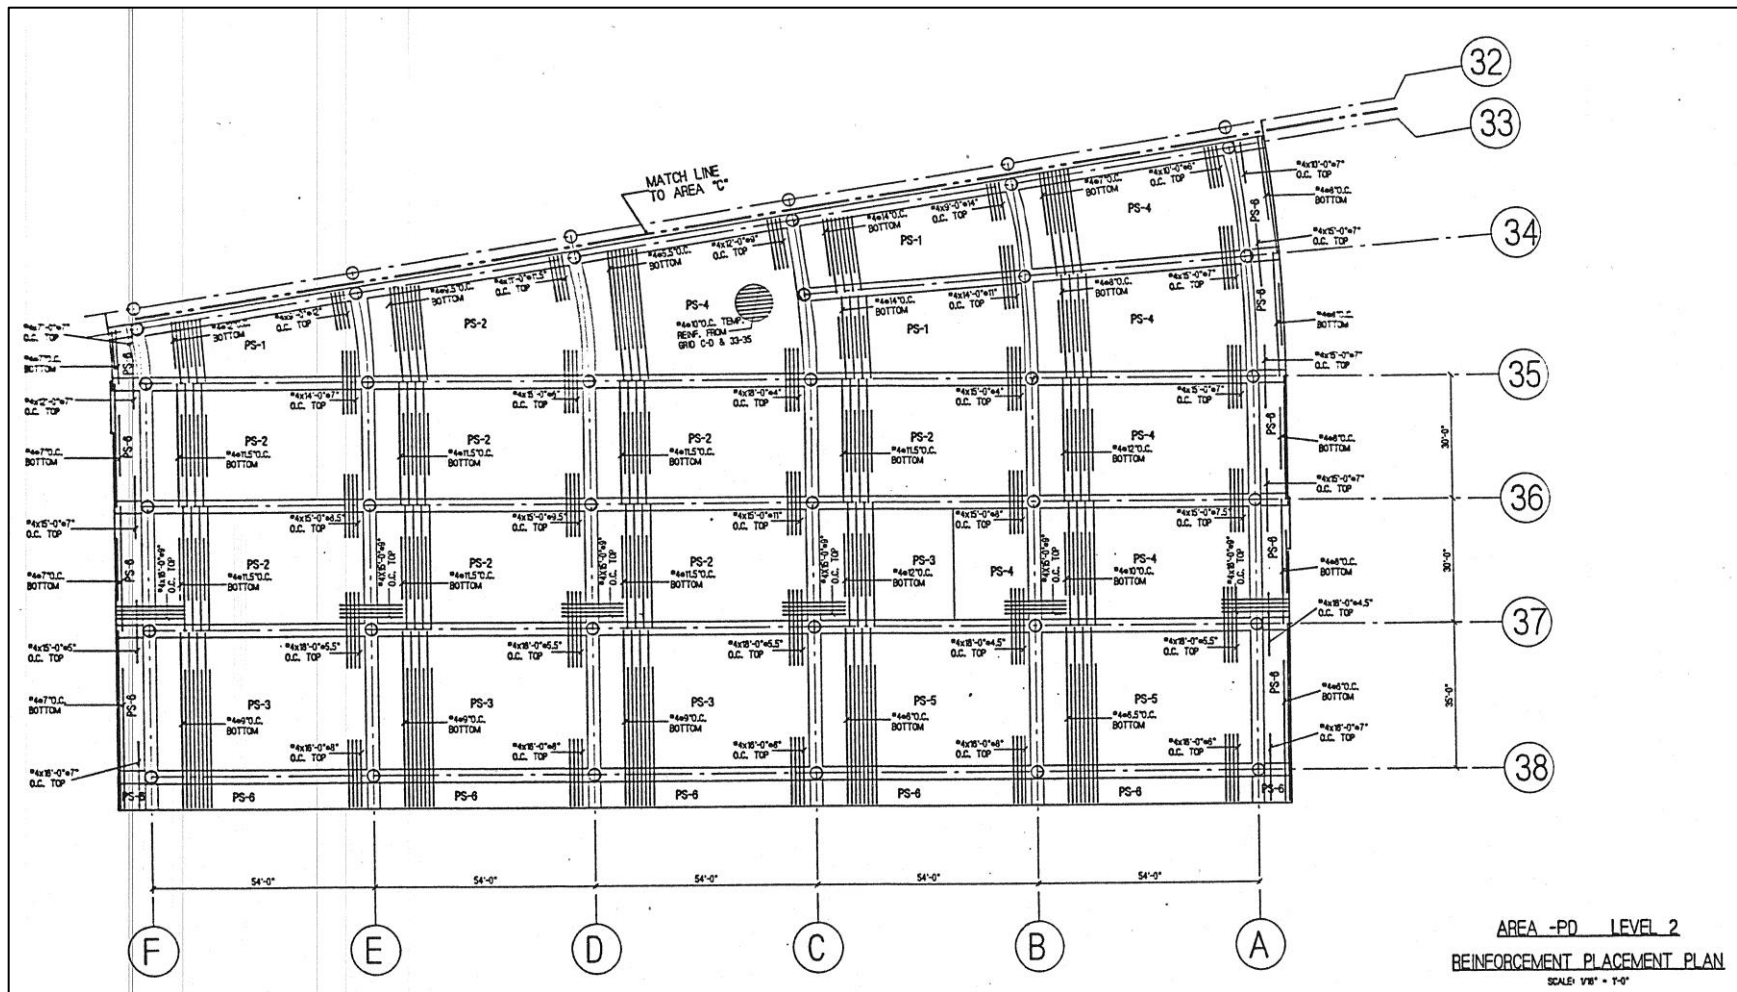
Example of the as-built structural drawings from 1988 showing the first floor (“level 2” on drawing) epoxy-coated rebar reinforcement system in structure D (the southeast corner).
